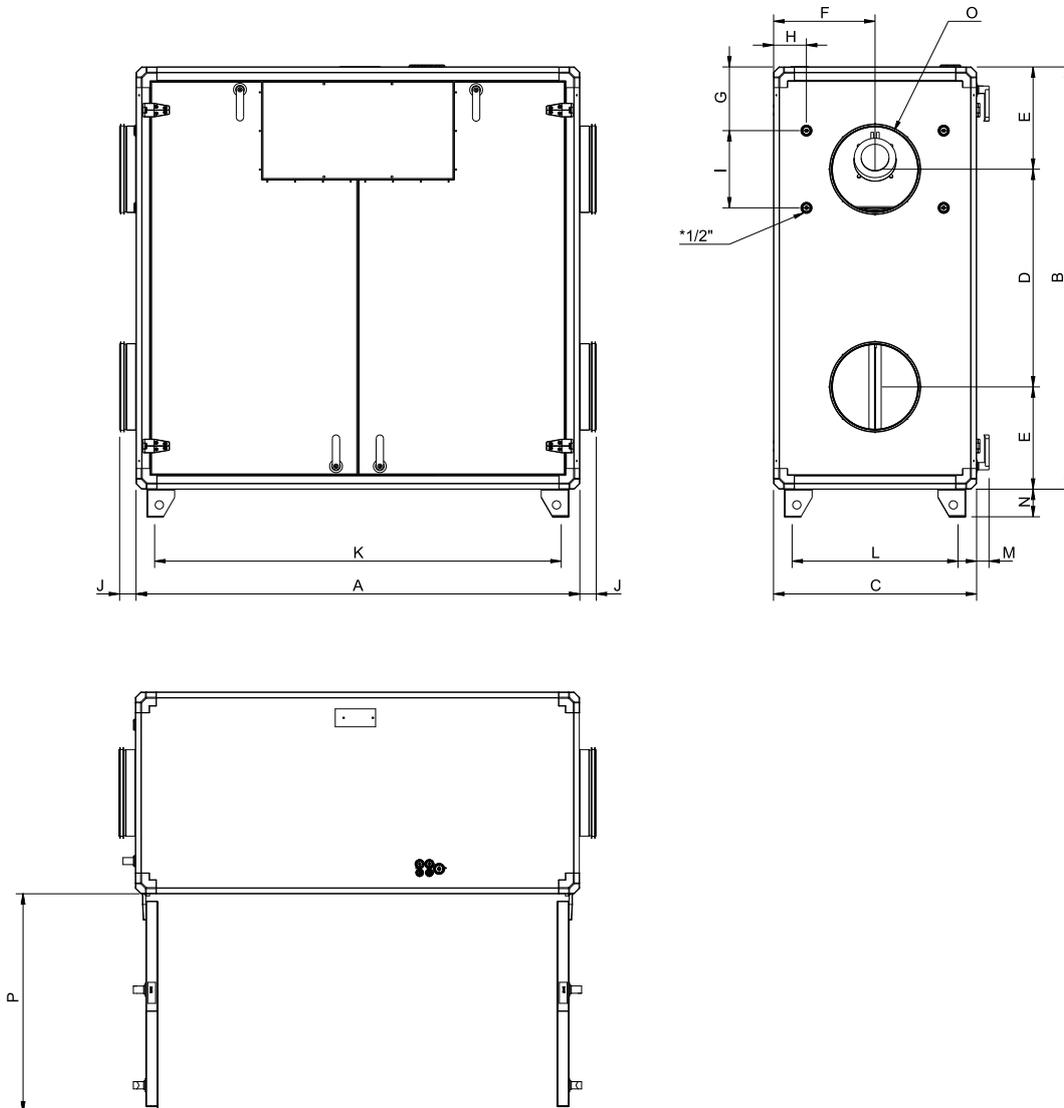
Dimensions (mm) SC03-SC04 (Drawn as left hand unit)
